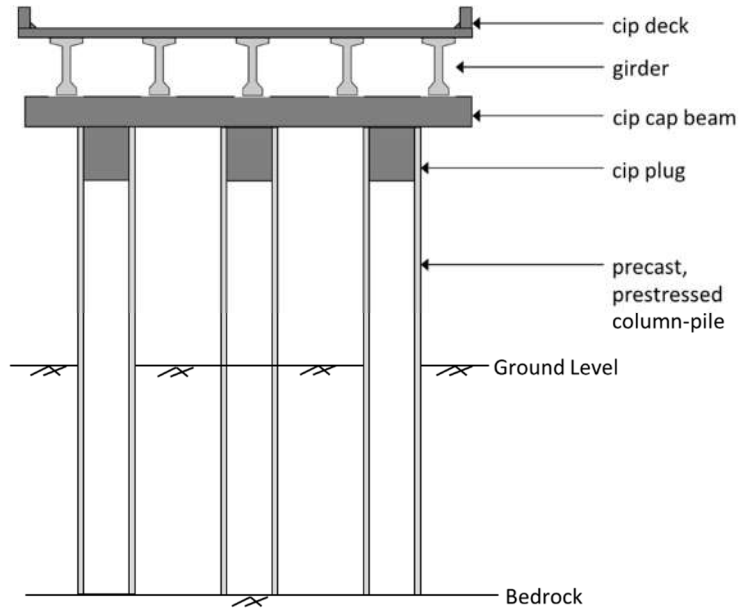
Typical Cross-section of bridge founded on Hollow Prestressed Concrete Column-Piles
